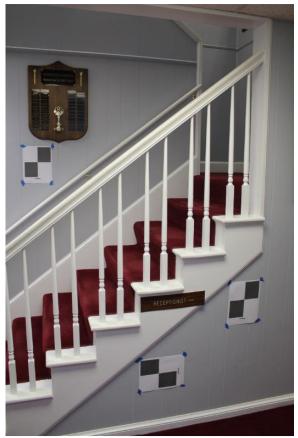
, Old Wallace Library, First Floor, Room 104, view of wood balustrade.
